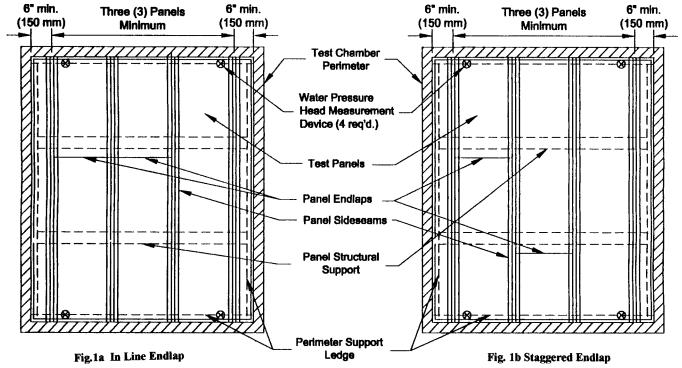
Plan of Typical Three-Span Test Specimen Mounted in Chamber
